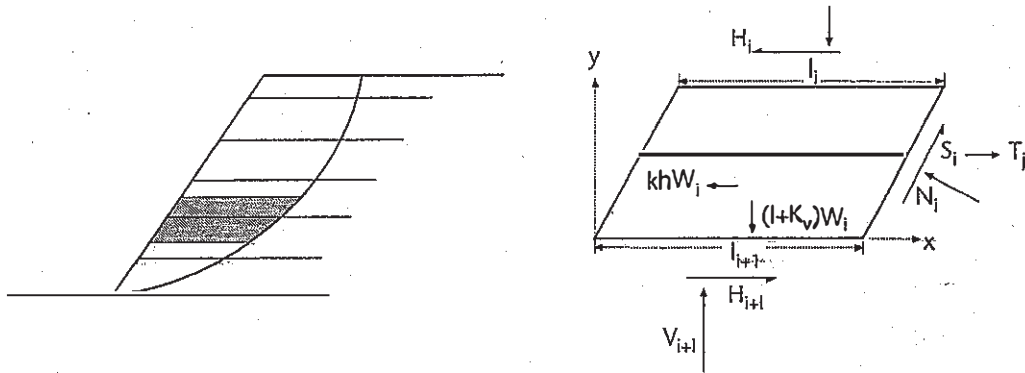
Forces acting on a single horizontal slice containing reinforcement
